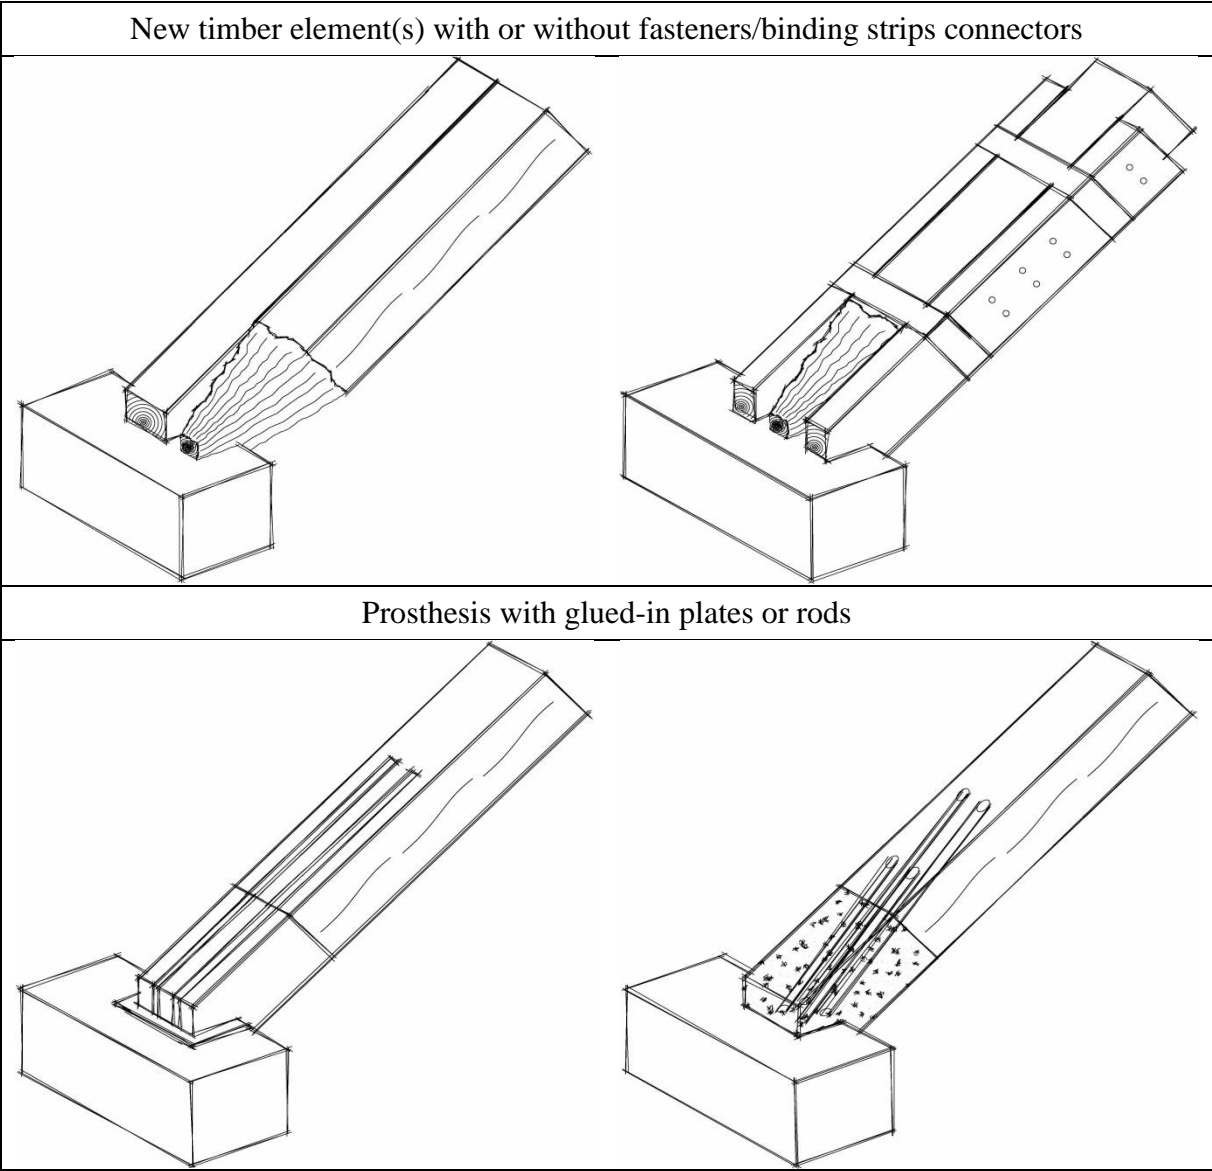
Techniques to retrofit or repair decayed birdsmouth joints (adapted from interventions on the decayed timber beam-end [36]).
